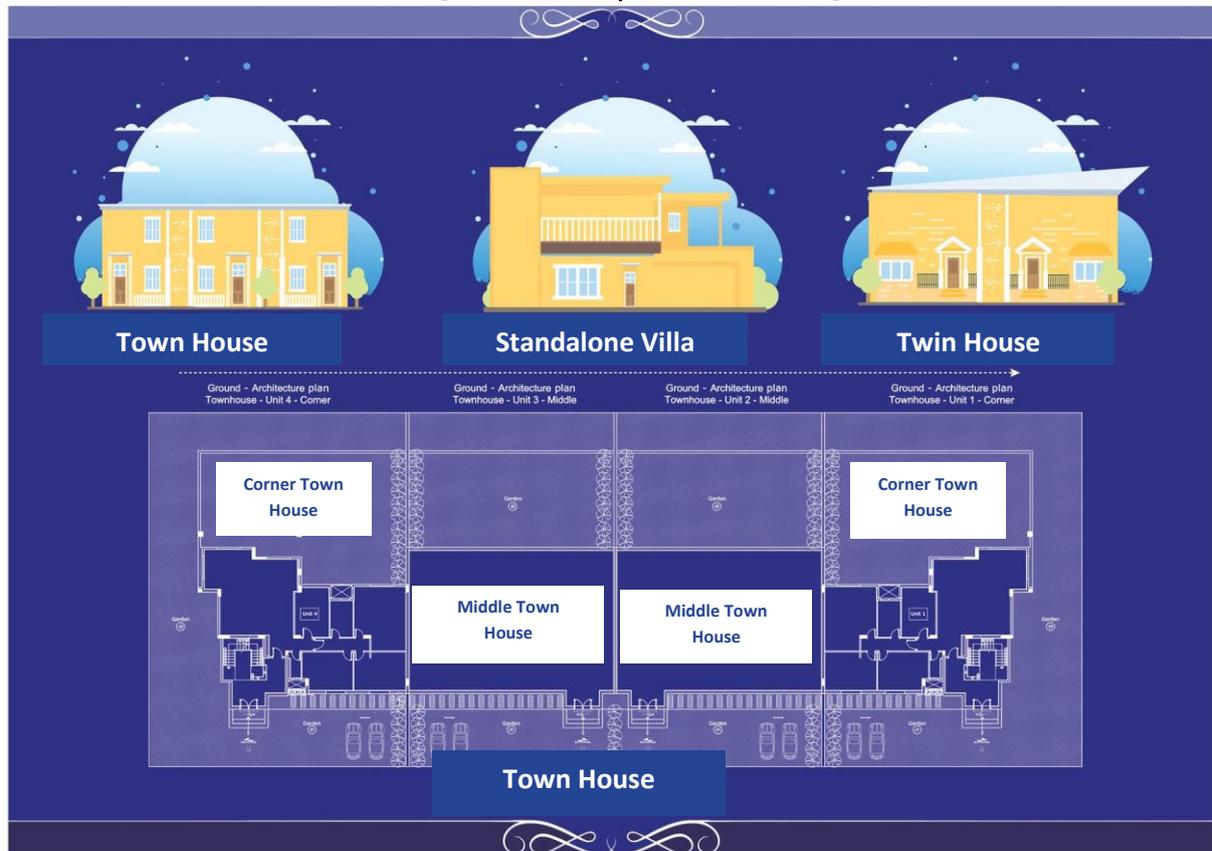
The difference between Townhouse, Twin house, and Standalone Villa.
